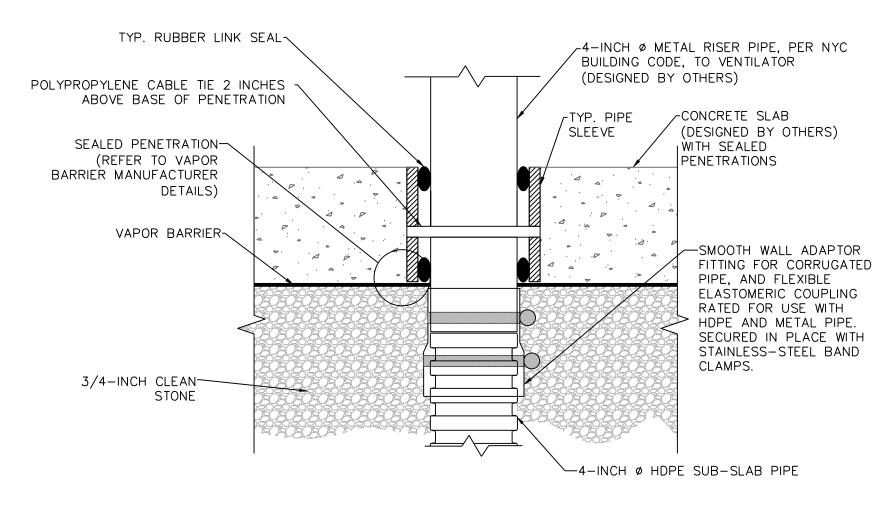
TYPICAL SECTION FOR PERFORATED
